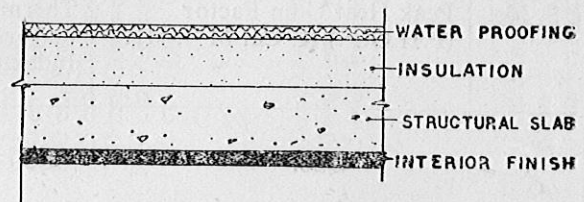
A GENERAL FLAT ROOF CONSTRUCTION
